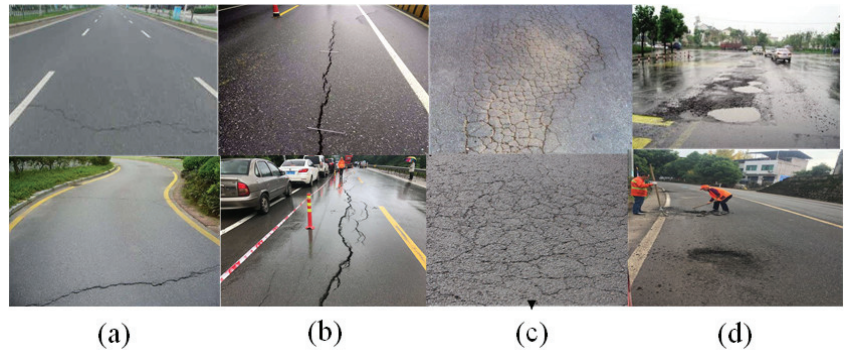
Partial image of four typical defect types in PCD1. (a) lateral cracking, (b) longitudinal cracking, (c) alligator cracking, and (d) pothole.
